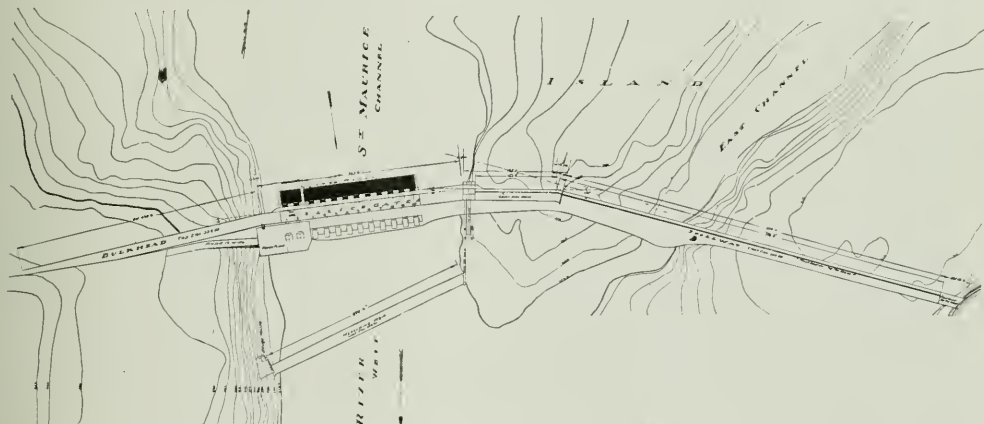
Plan of the Proposed Dam on the St. Maurice River.
